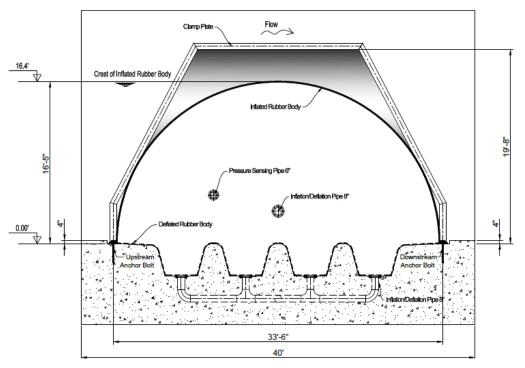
Typical Details Inflatable Dams Stag/Fawn Island (image courtesy Dyrhoff)
